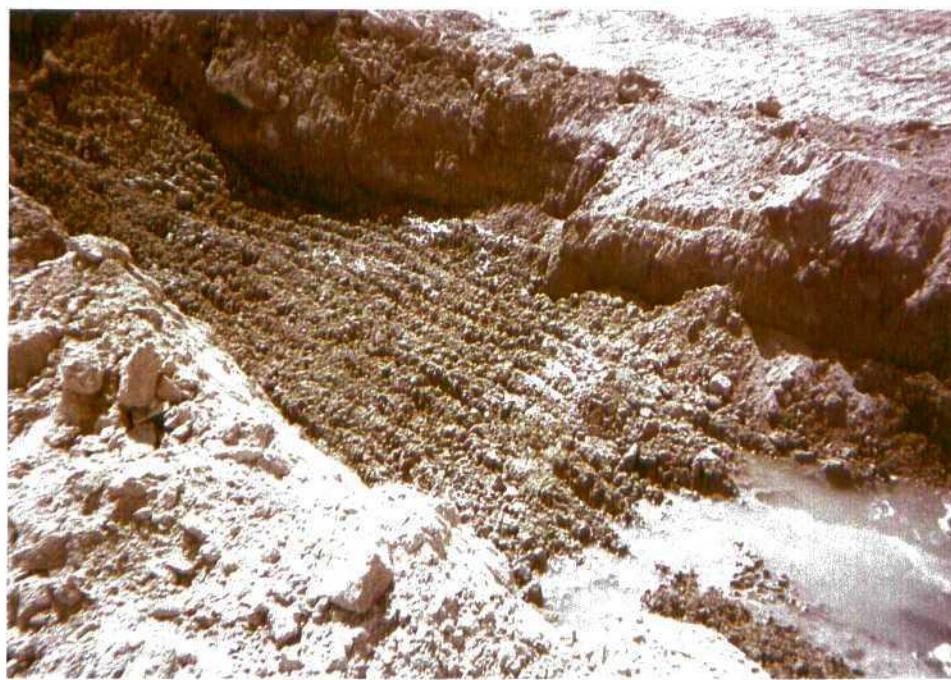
Contaminated soils and groundwater at 34 feet below ground surface.
